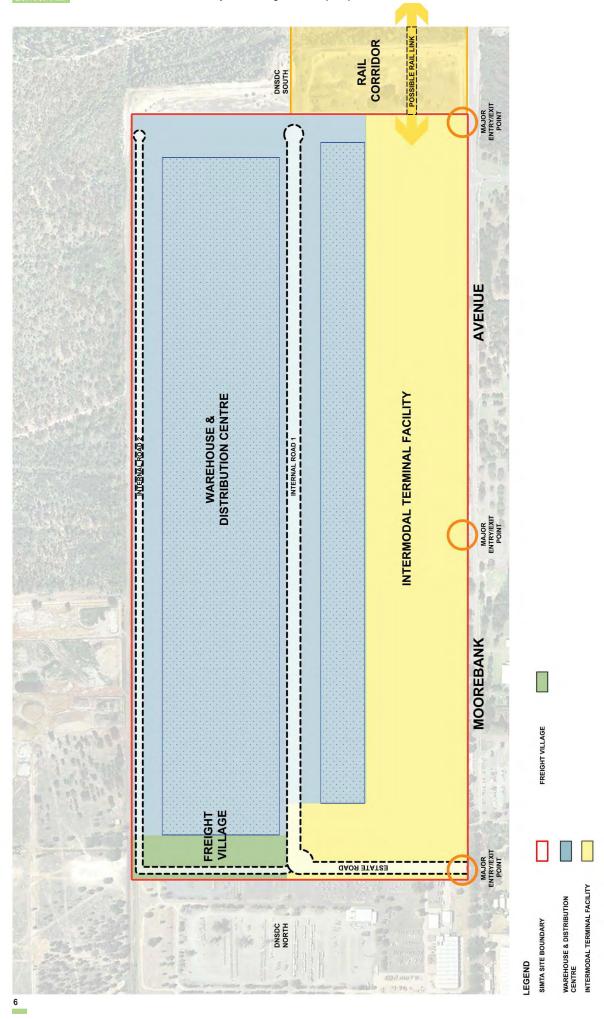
SIMTA Indicative Precinct and Land Use Plan
